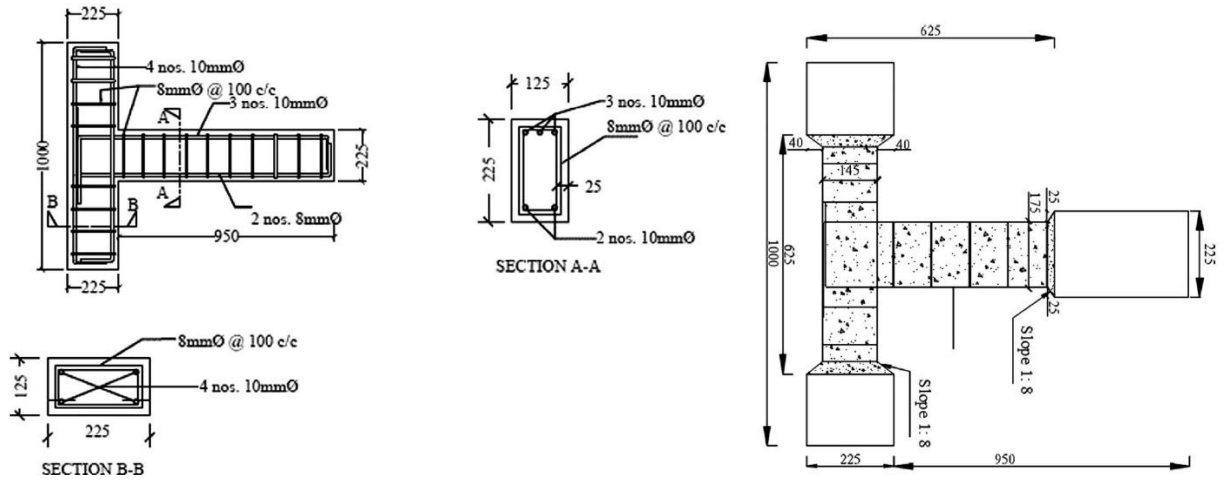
Left: Dimensions and reinforcement details of the specimens. Right: Schematic showing the concrete area removed from the damaged specimens. (Sharma and Bansal 2019)
